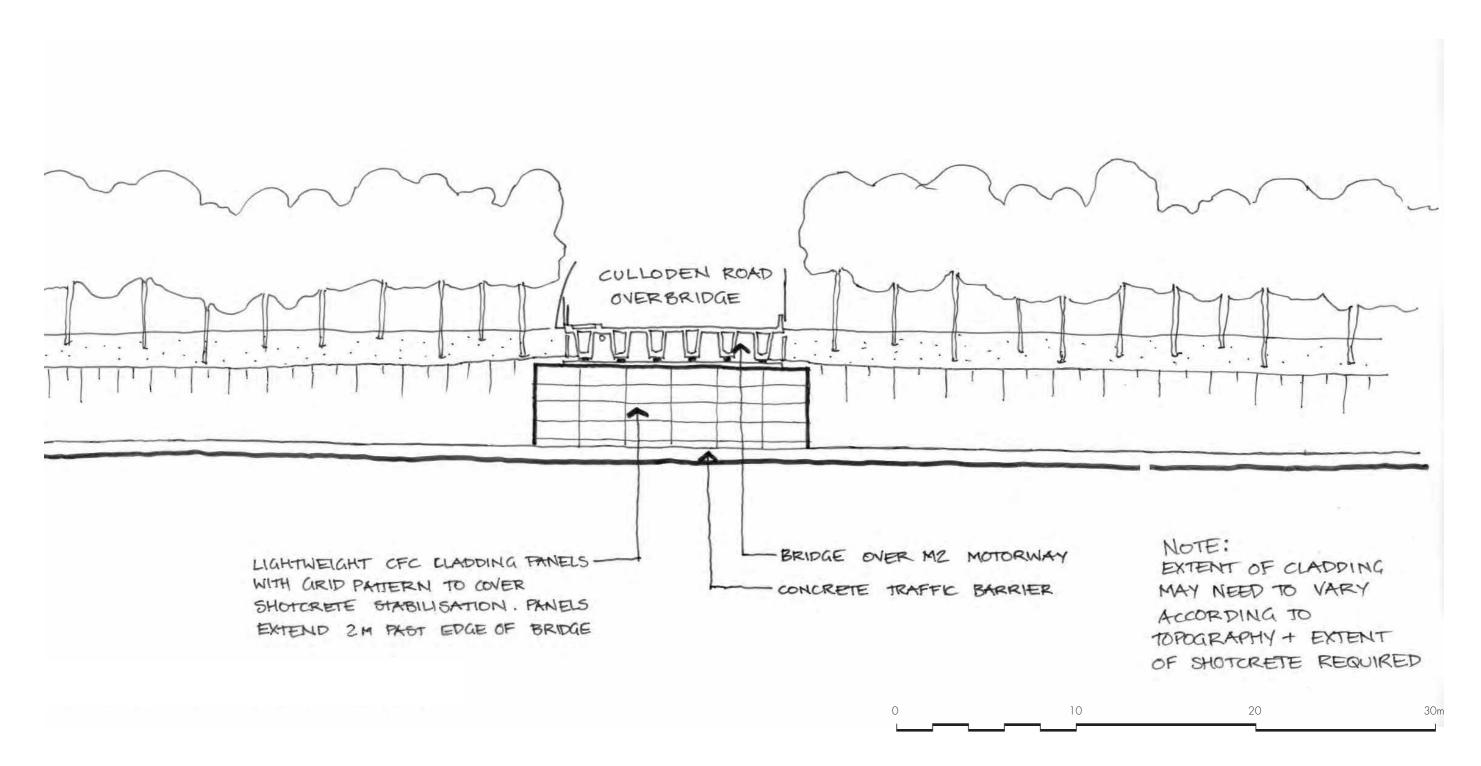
Type C retaining walls - Compressed Fibre Cement Cladding Panels at Culloden and Christie Road Overbridges
